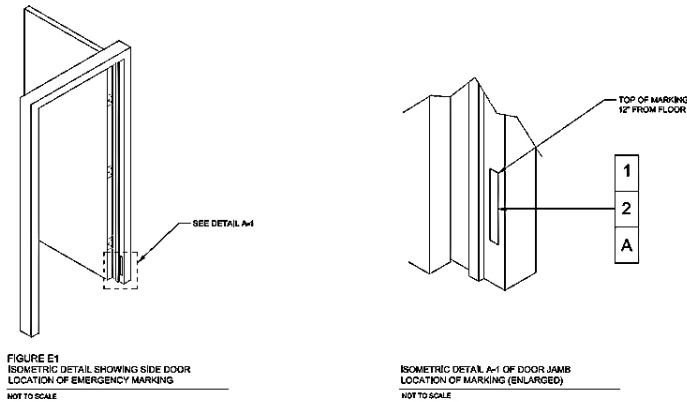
depicts the location where entrance door fire emergency markings required by this rule must be placed. Such markings are to be affixed to the door jamb on the hinged side of the entrance door as shown in Figures E1, and must be fully visible from the corridor side of the door when the door is in the closed position.
